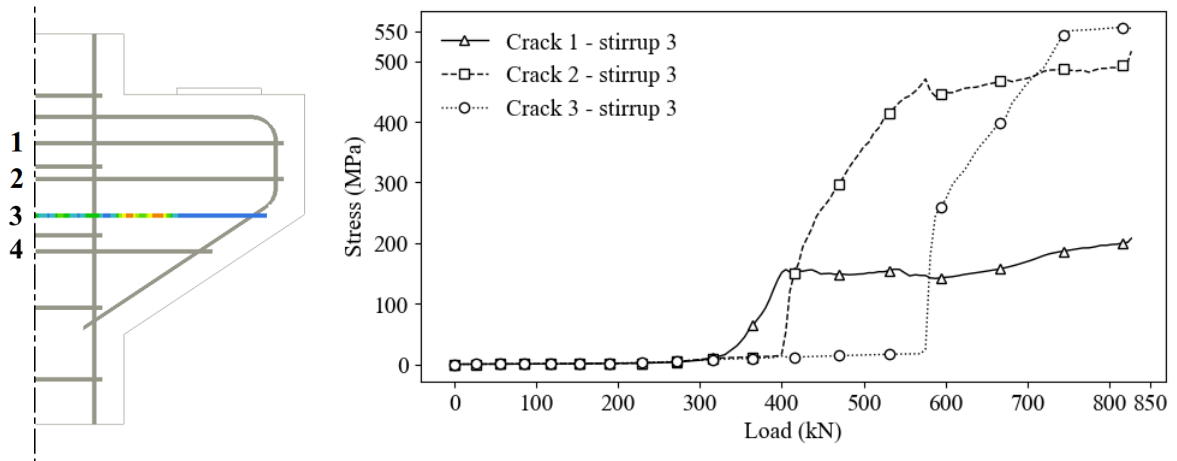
Development of stresses in stirrup 3 up to failure.
